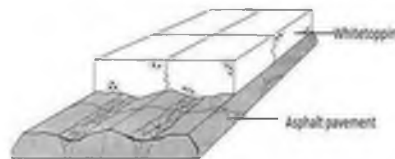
Schematic diagram of a pavement structure with whitetopping [5]
